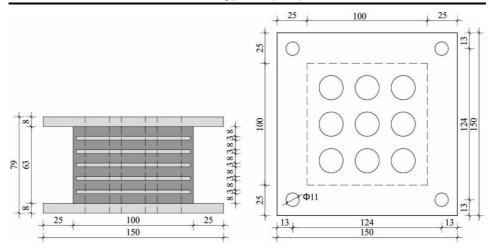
The dimensions of elastomeric bearings with nine holes.
